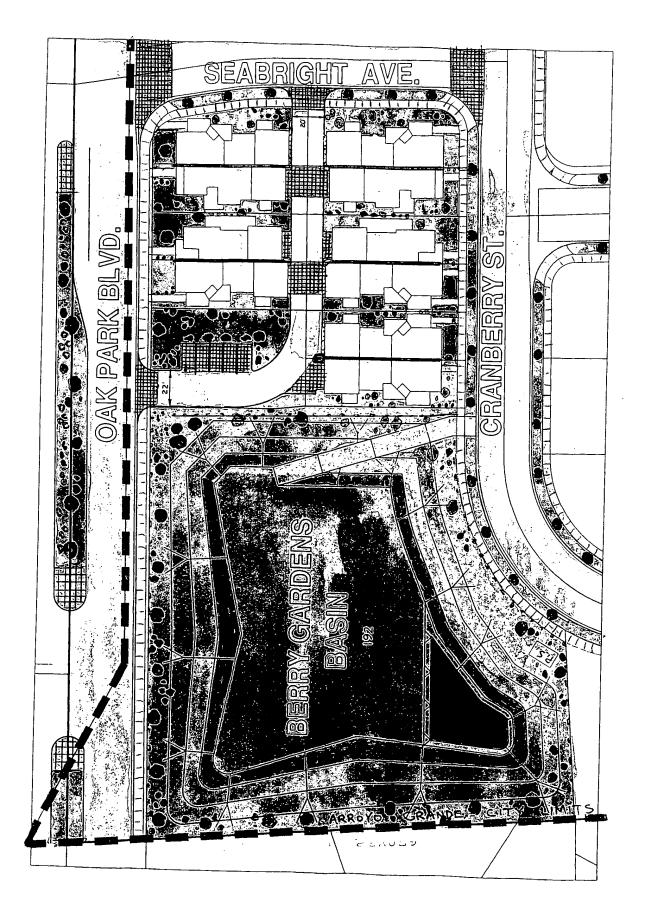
PRELIMINARY SITE PLAN - Patio Home Residential - South (And Ponding Basin)
